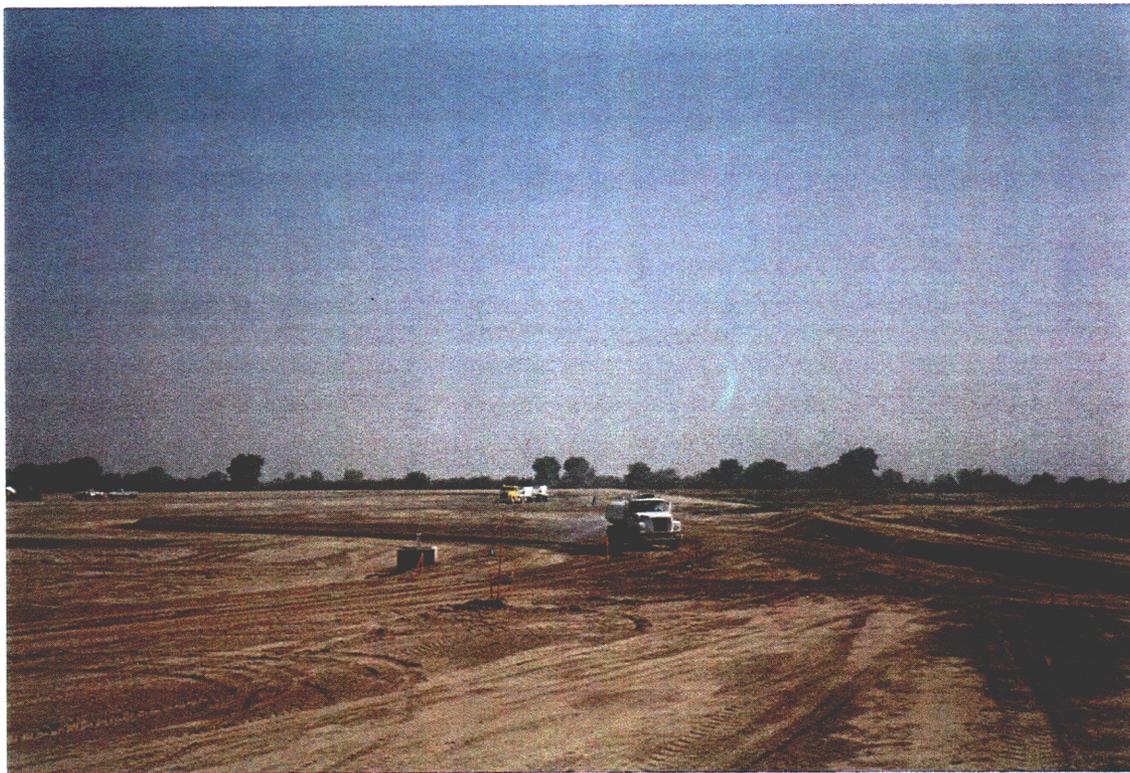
CONSTRUCTION OF DEMONSTRATION WETLANDS
